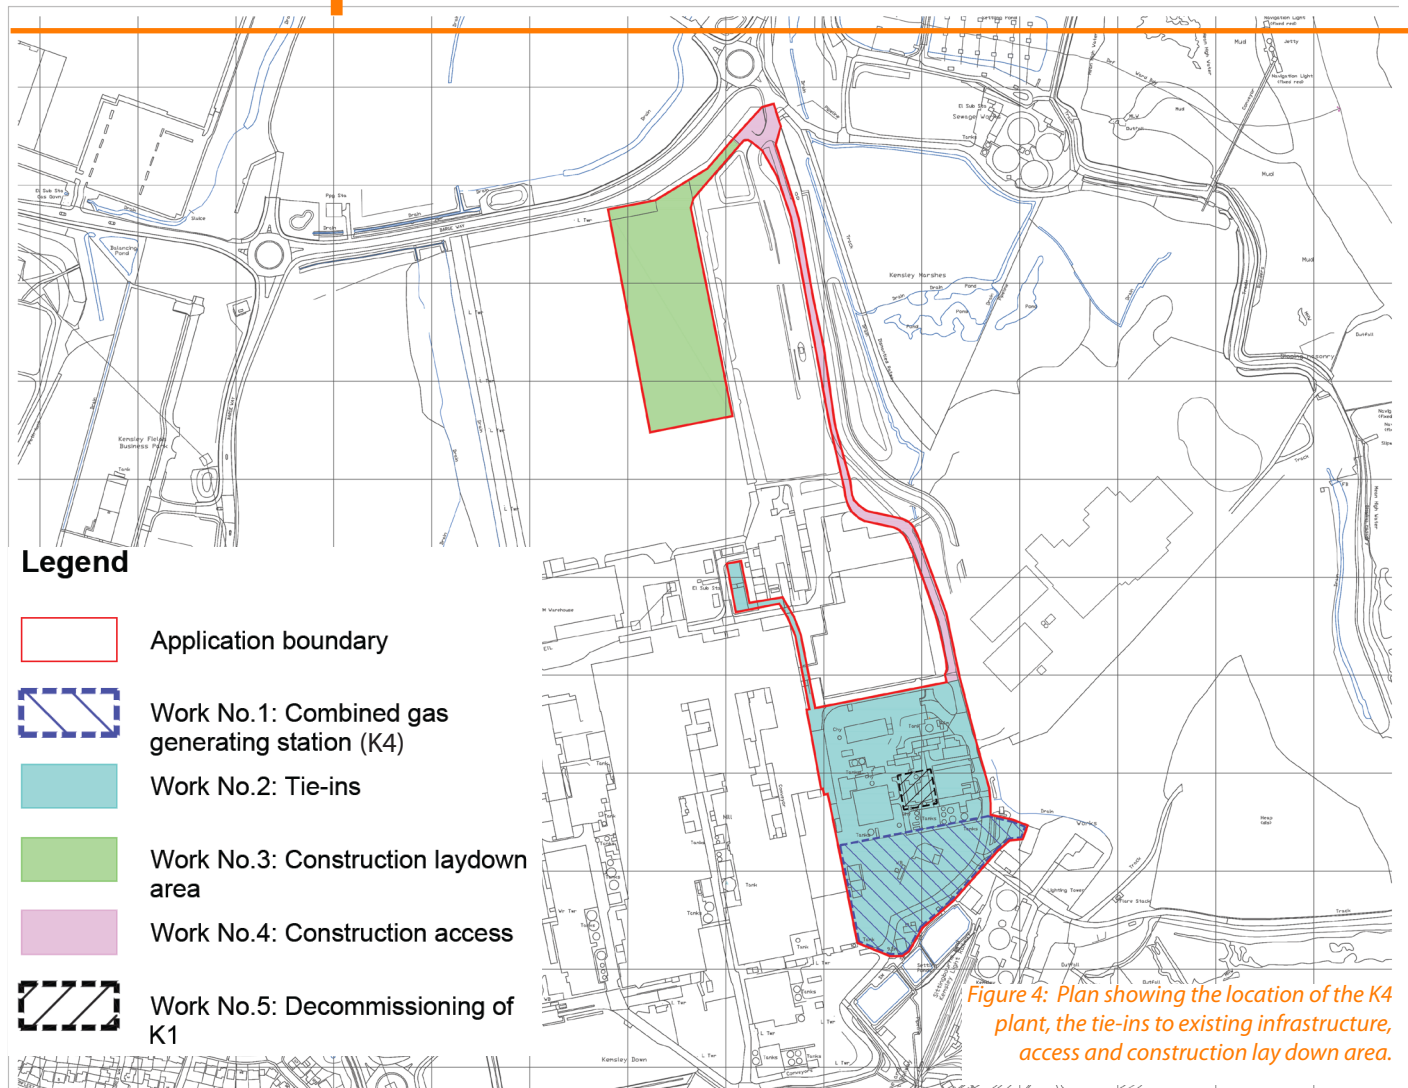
Plan showing the location of the K4 plant, the tie-ins to existing infrastructure, access and construction lay down area.
